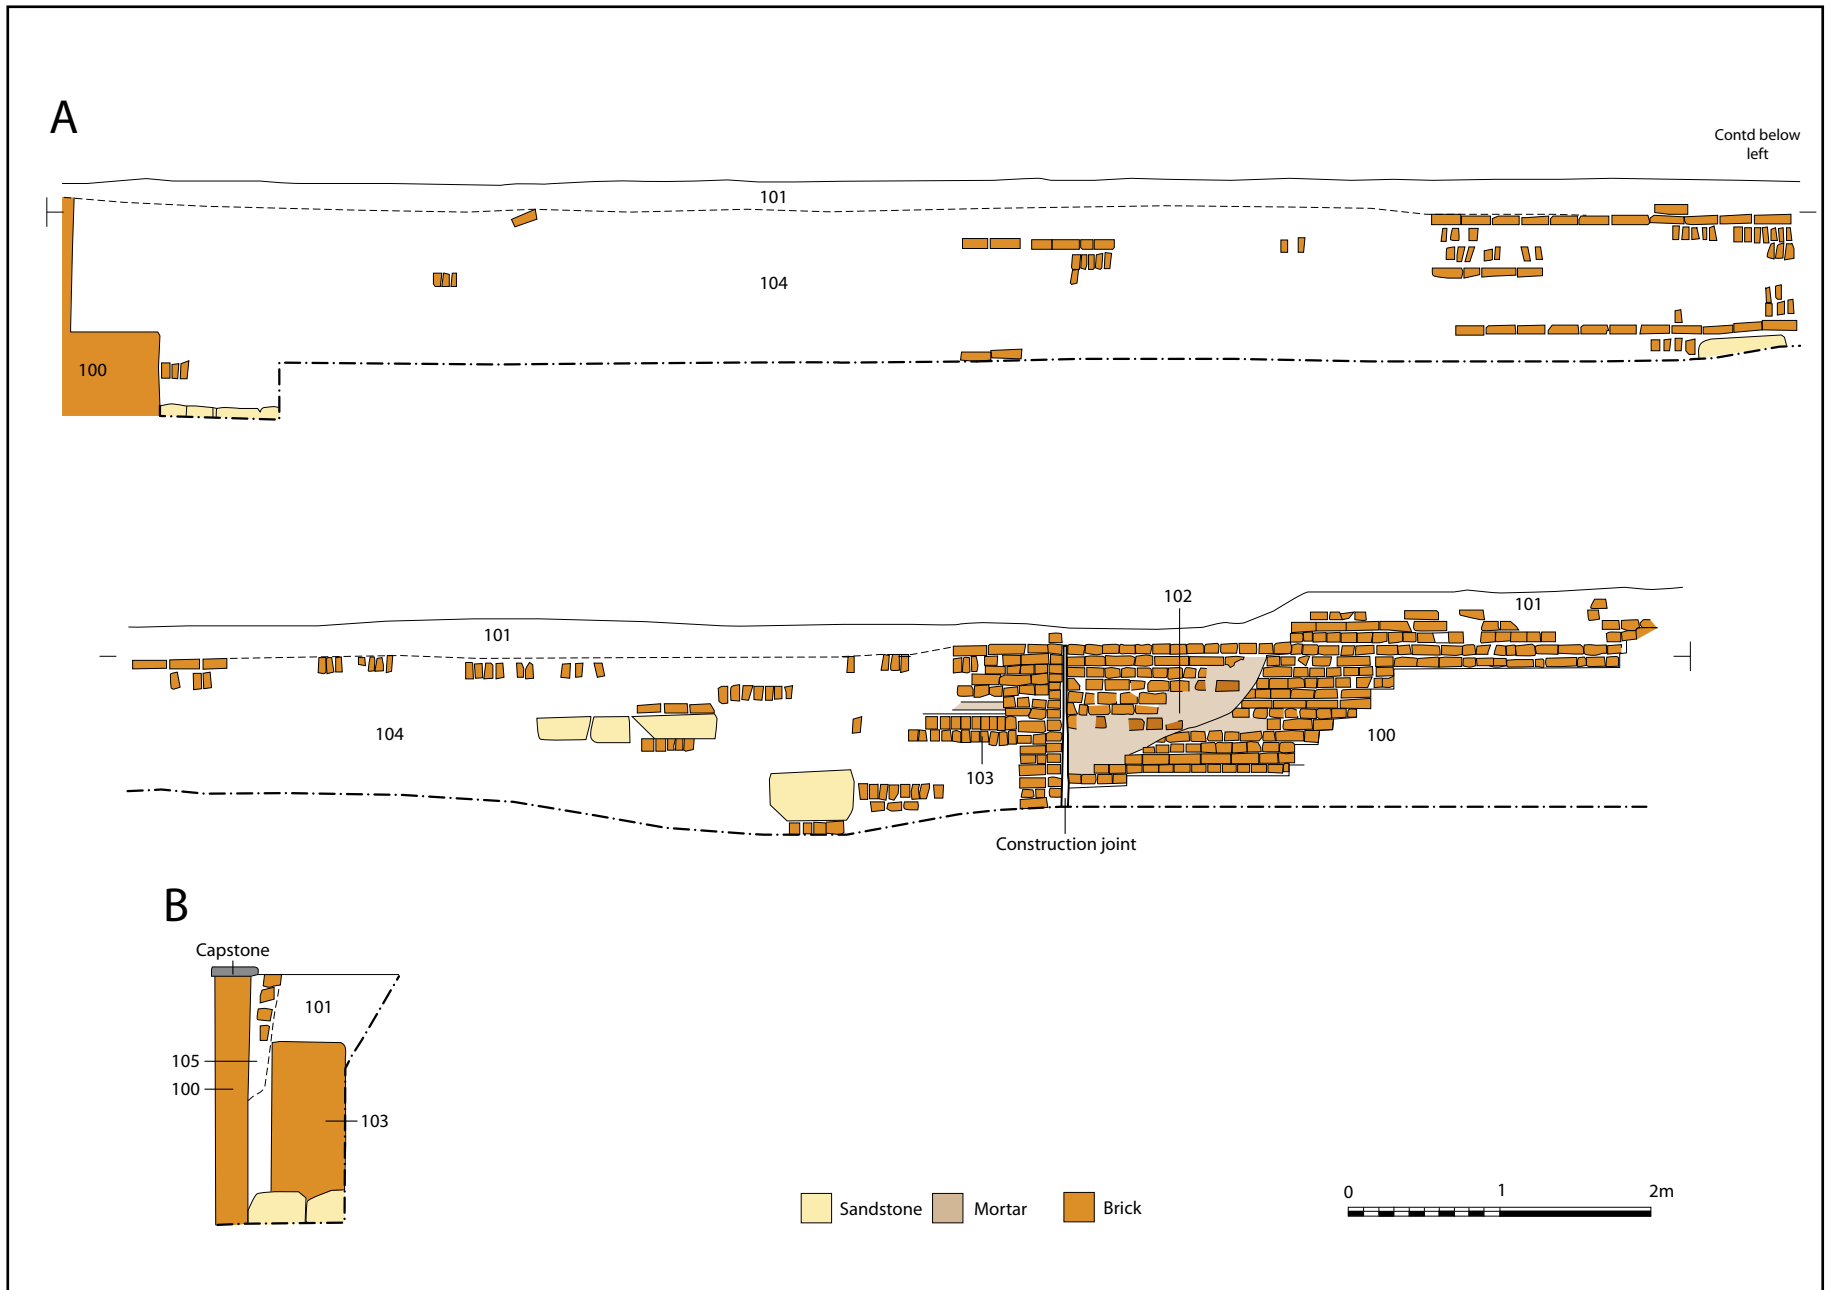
East-facing elevation of ha-ha walls 100, 102-104 and north-facing section of ha-ha walls 100 and 102
